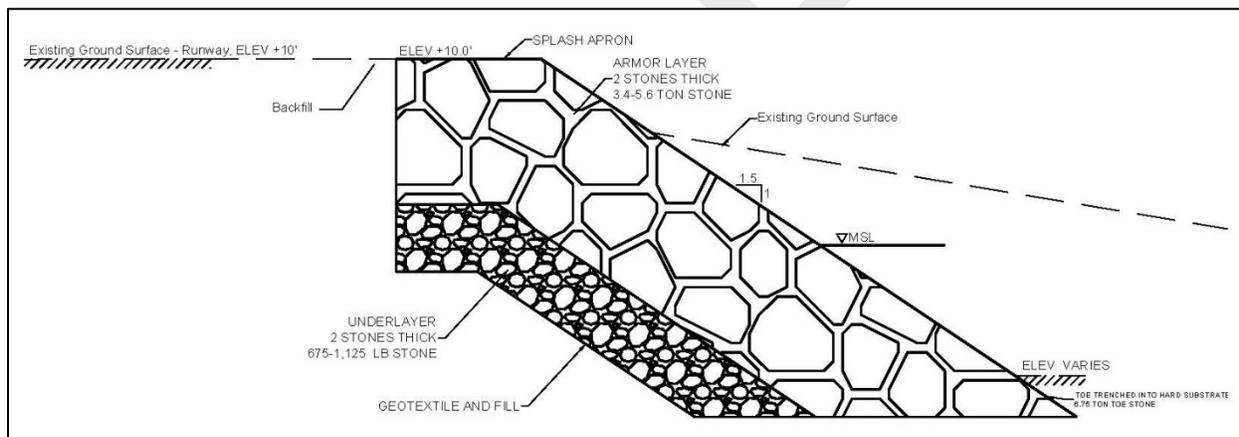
Alternative 1 - Preliminary Rock Revetment Cross Section
